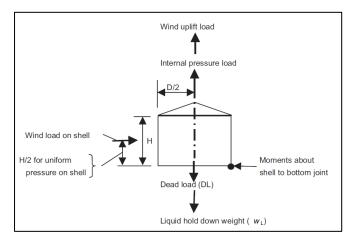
Loads working on tanks due to wind, internal pressure, dead load and liquid weight
